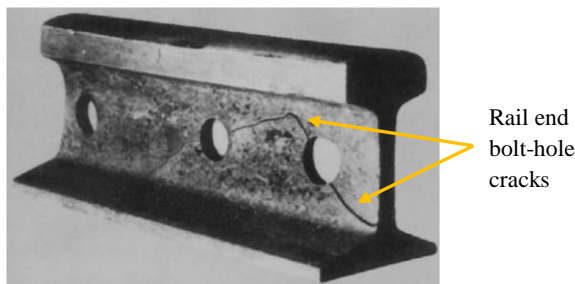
Typical Rail End Bolt-Hole Crack [2]
